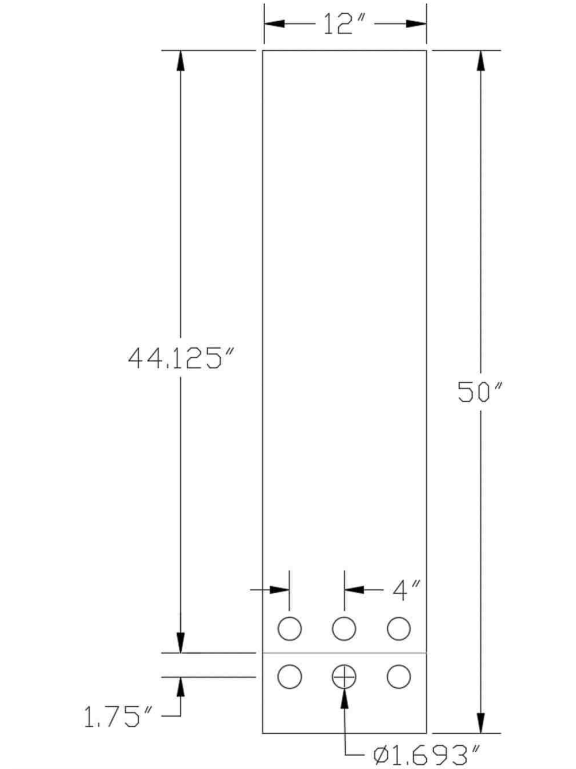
Circumferential Reinforcement Layout per Foot (Six #14 Reinforcement Bars per Foot)
